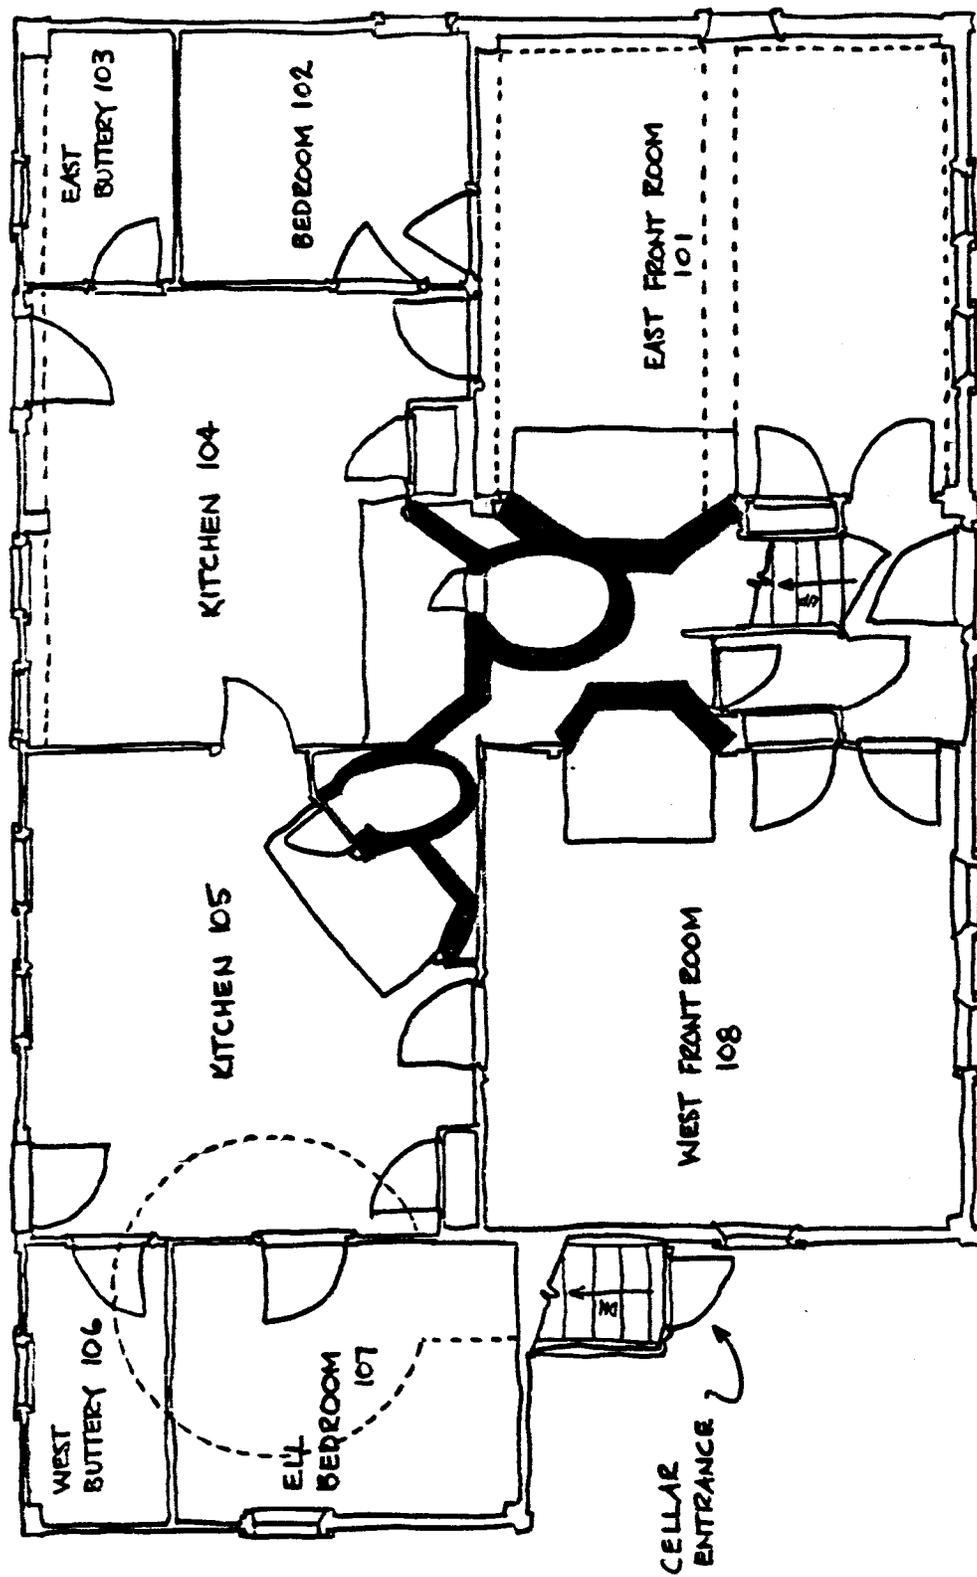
Atwood-Higgins House: Conjectural First-Floor Plan, 1800-1820.
